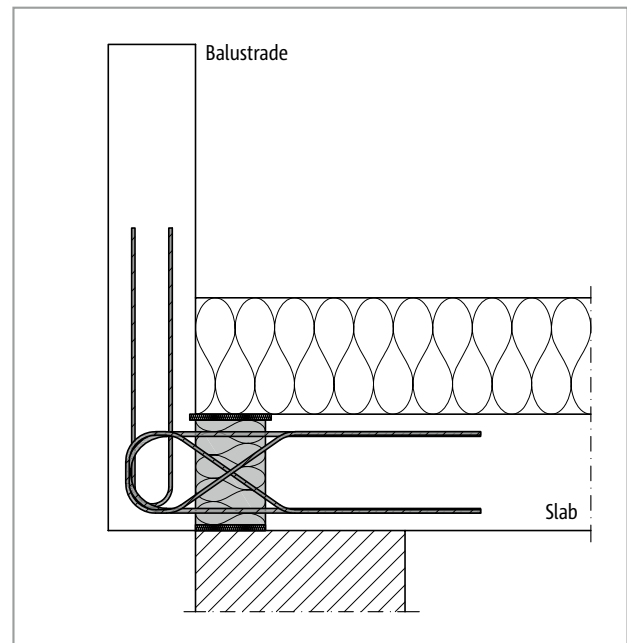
Schöck Isokorb® XT type F: Connection of a frontally attached balustrade with thermal insulating masonry
